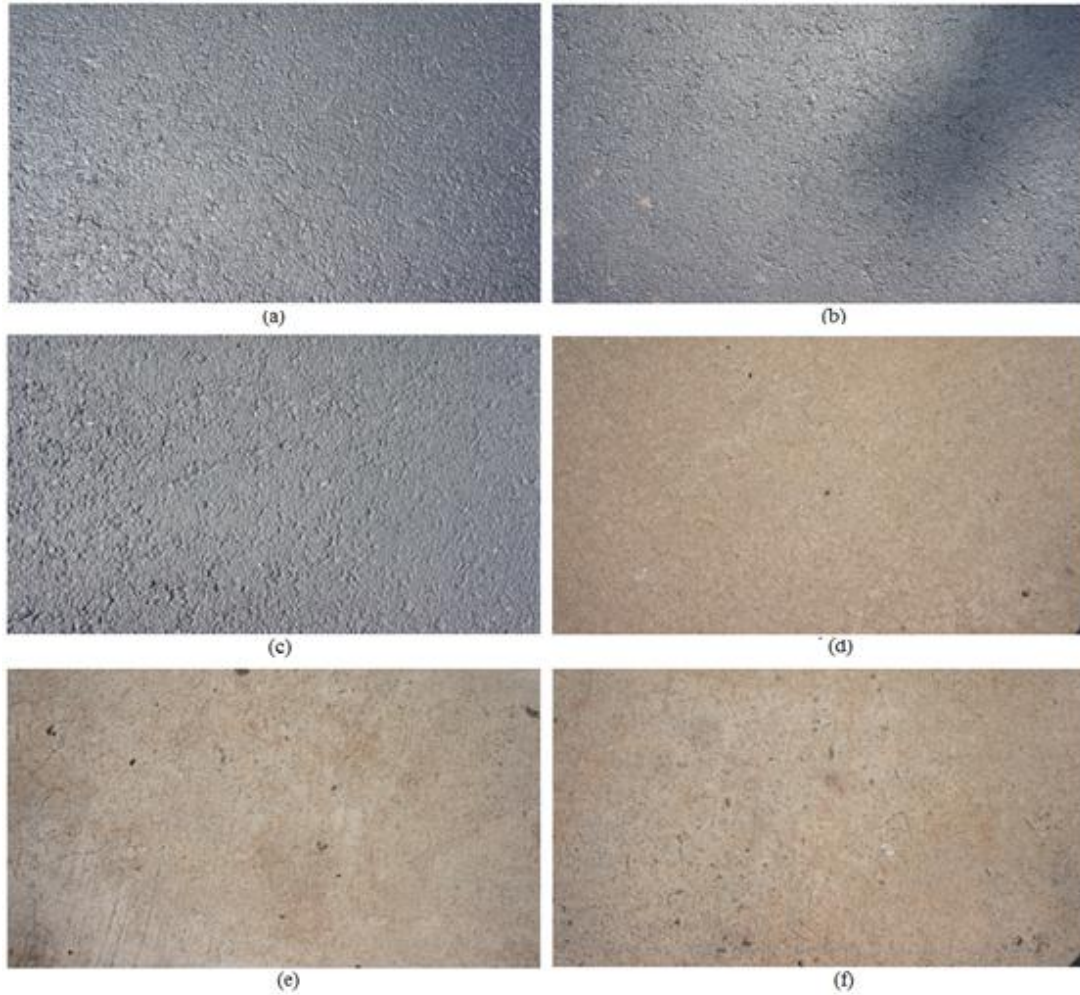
Pavement Texture of (a) Test Site 1; (b) Test Site 2; (c) Test Site 3; (d) Test Site 4; (e) Test Site 5; (f) Test Site 6
